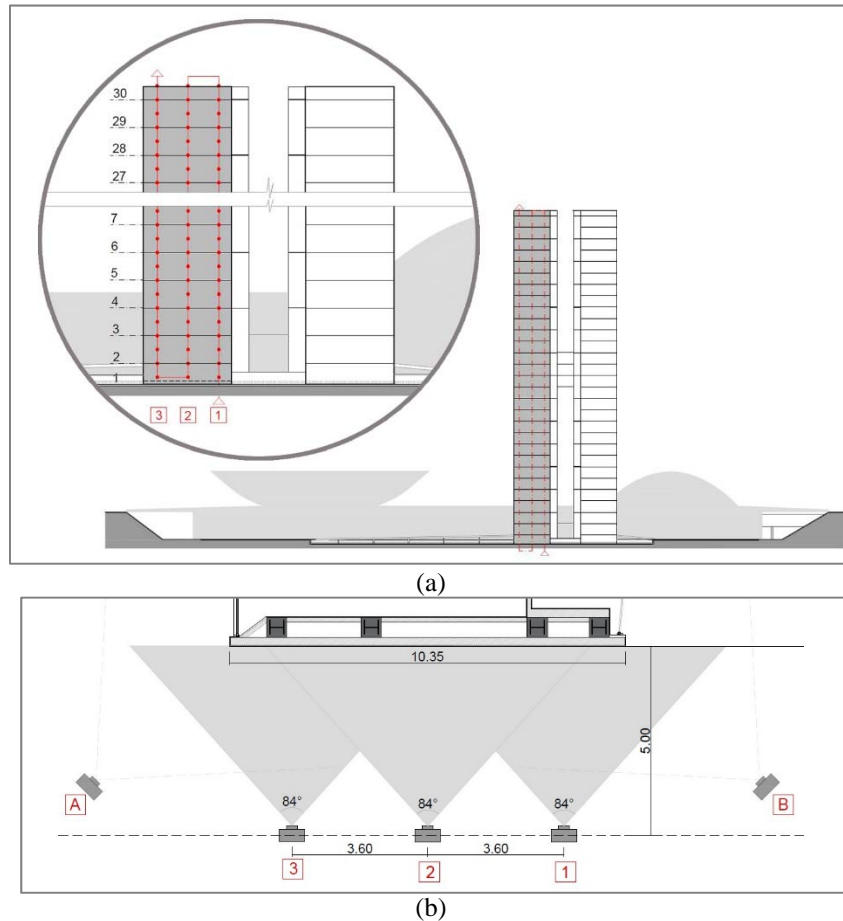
Flight plan for the South tower, Southeast gable: a) elevation showing the flight lines; b) plant with the distances established for the photographic takes. (Source: the author, 2019.)
